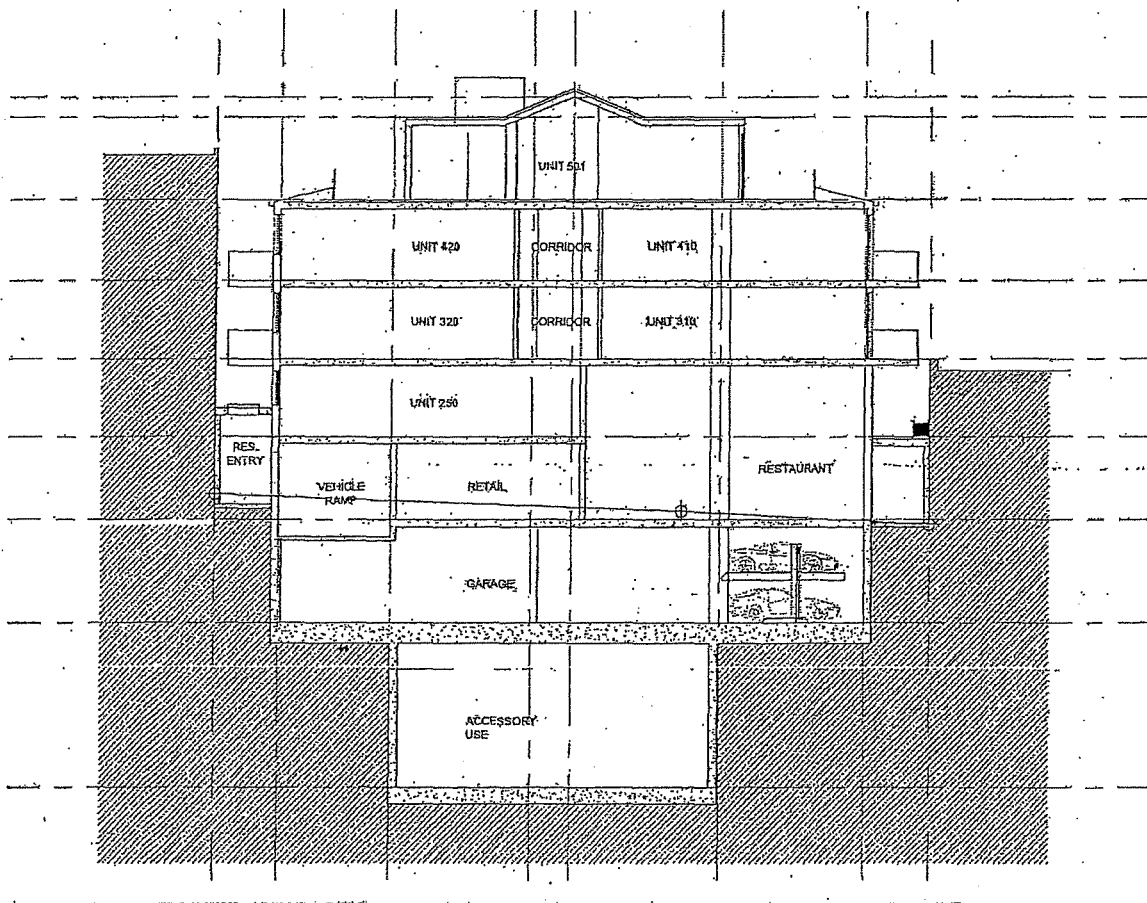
PROPOSED 1731 POWELL ST NORTH-SOUTH SECTION
